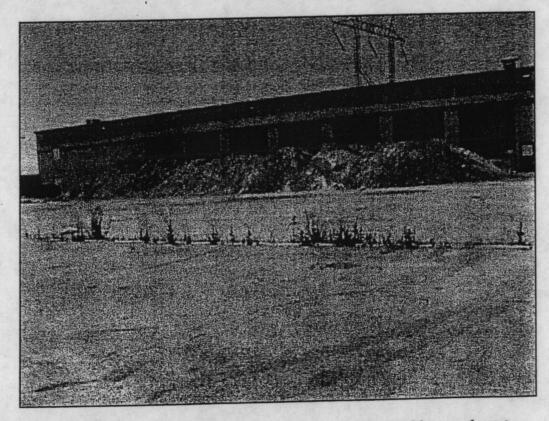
Excavated dry well and adjacent soil on west side of building, August 2001.
